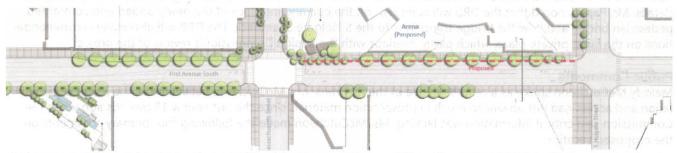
Excerpt from Stadium District Study Street Concept Plan for 1st Ave S between S Massachusetts St and S Holgate St
